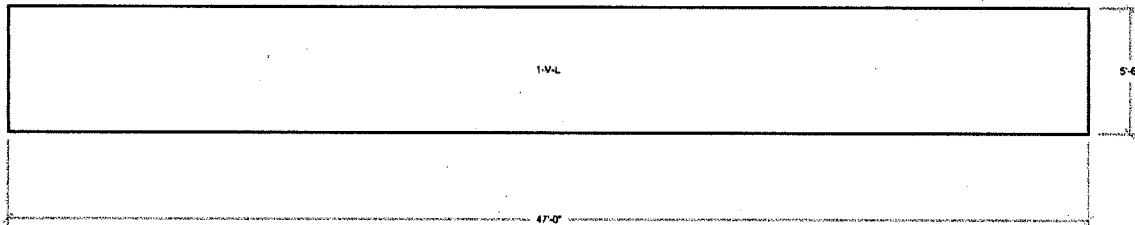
H.7-16: Tunnel and Access Region Basemat Looking Down Vertical Reinforcement Zones Near Side and Far Side Faces
